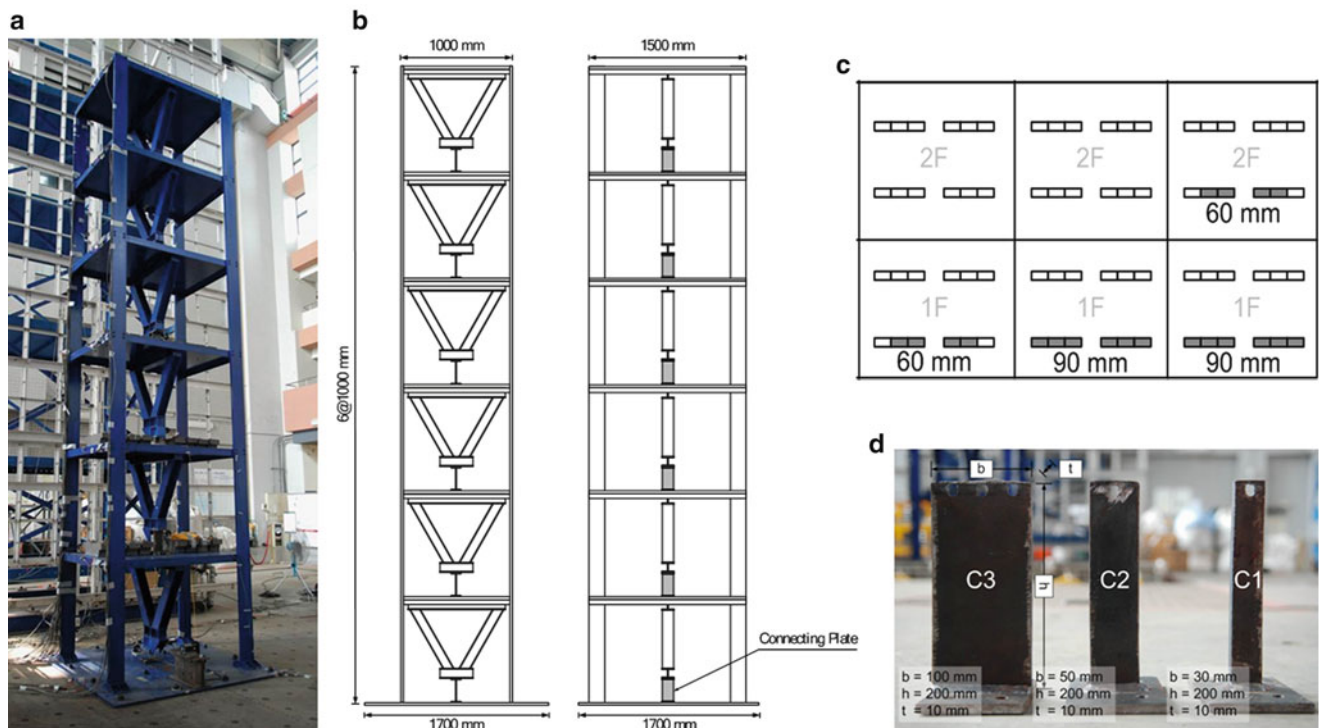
The 6-story steel frame for experimental study; (a) Photo of the test structure, (b) Front view, (c) Lateral view (Grey area indicate the connecting plate was used in the seriously damaged cases), (d) three connecting plates used in seriously damaged cases
